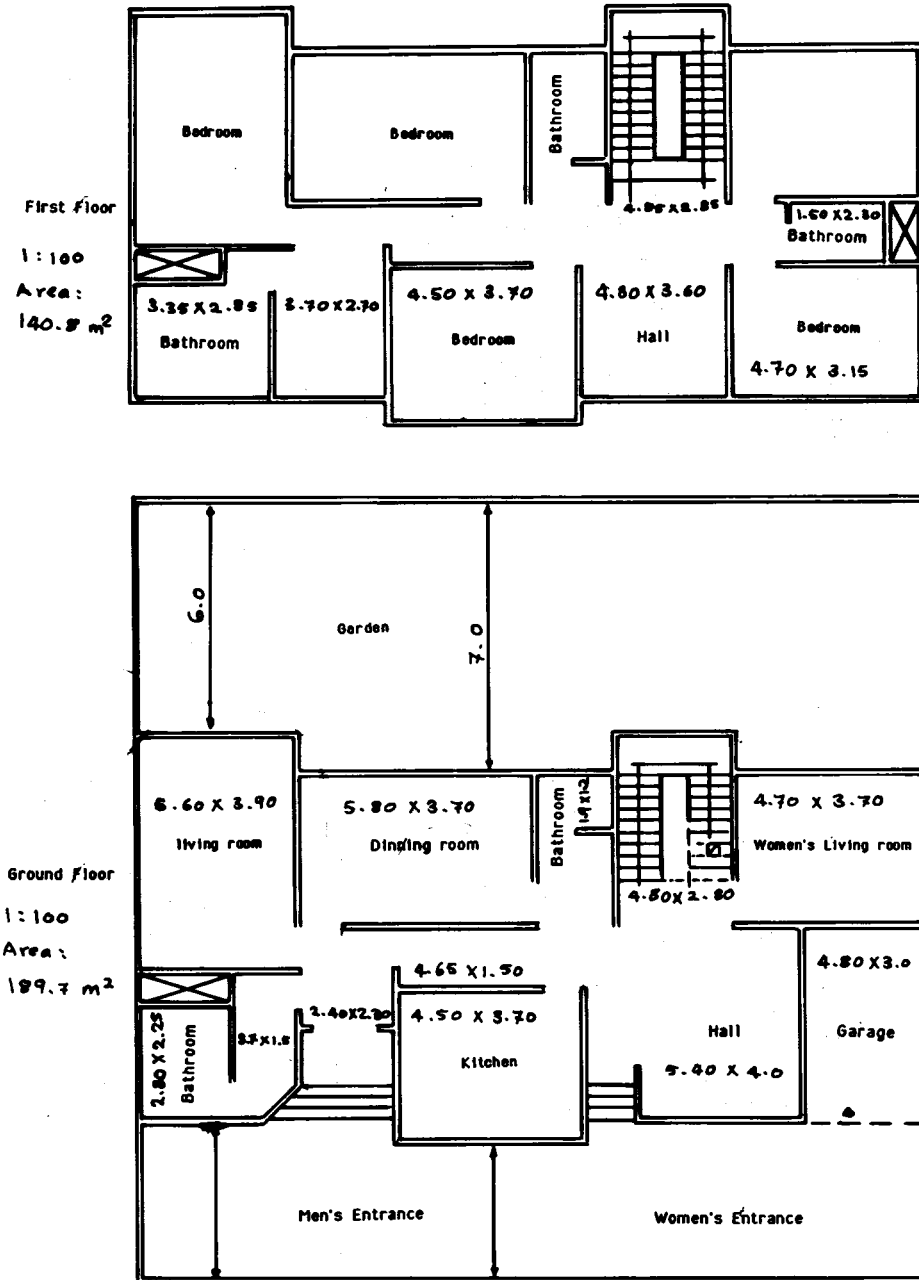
House plan (No.8). Source: Uraija submunicipality.
